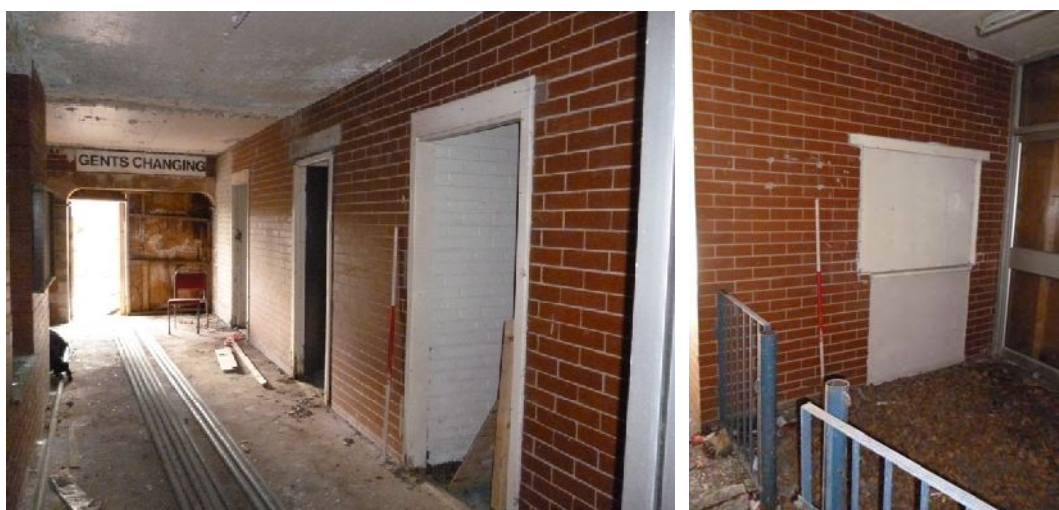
(left): South end of the west elevation of West Building, Ground Floor Room 1
